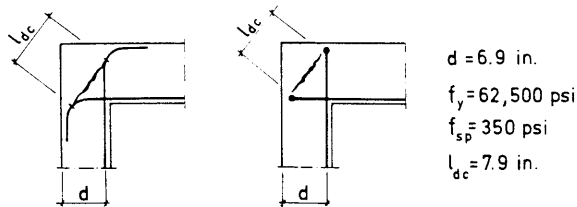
Positions of Diagonal Cracks and Approximative Data for Two Corner Reinforcement Details (1 in. = 25.4 mm; 1 psi = 6.9 kN/m²)
